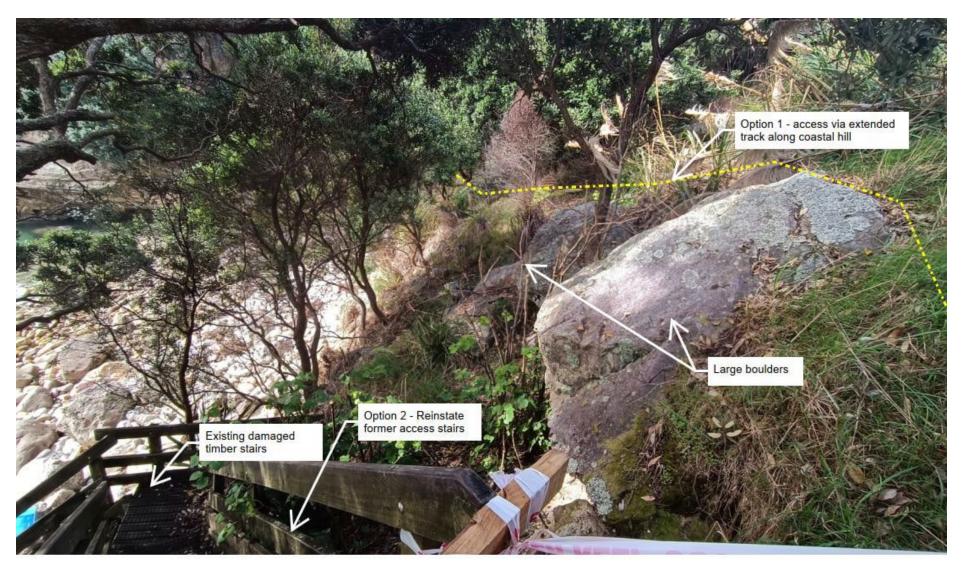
Gemstone Bay Beach Access Damage and Mitigation Options (view from top of access stairs).
